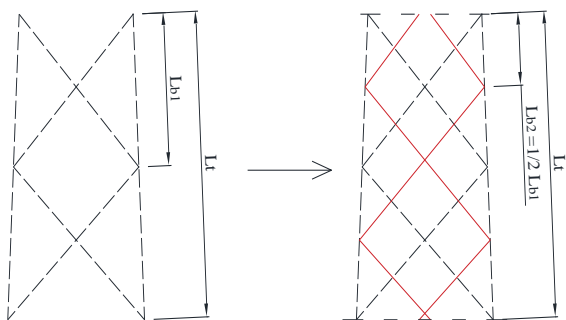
Leg reinforcement – an additional X-bracing pattern made of framework members
